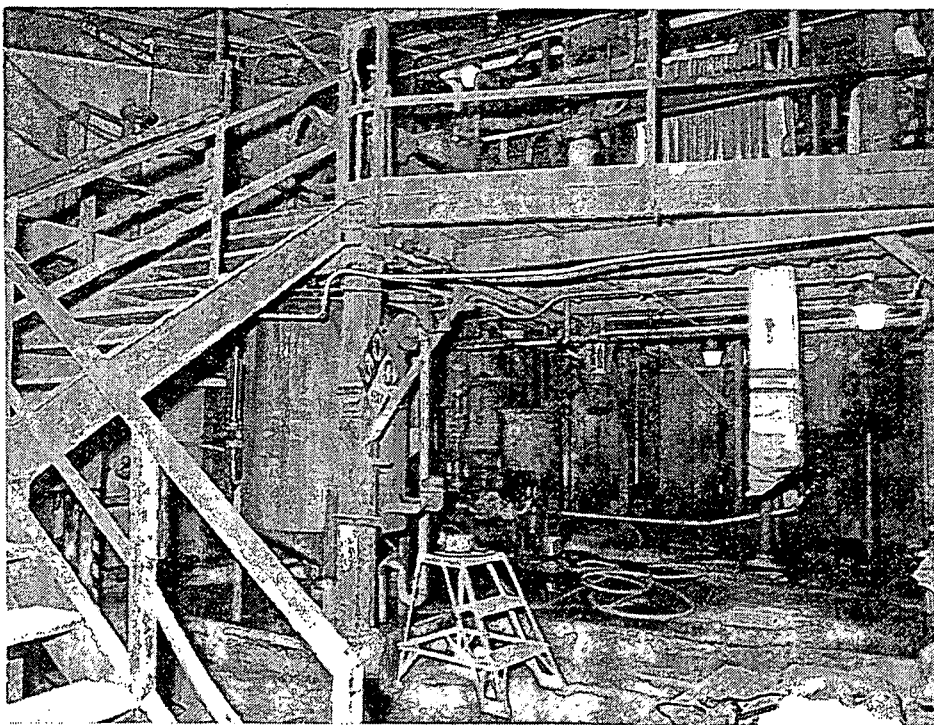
Building 9B - Sump Treatment Tanks and Filter Press
